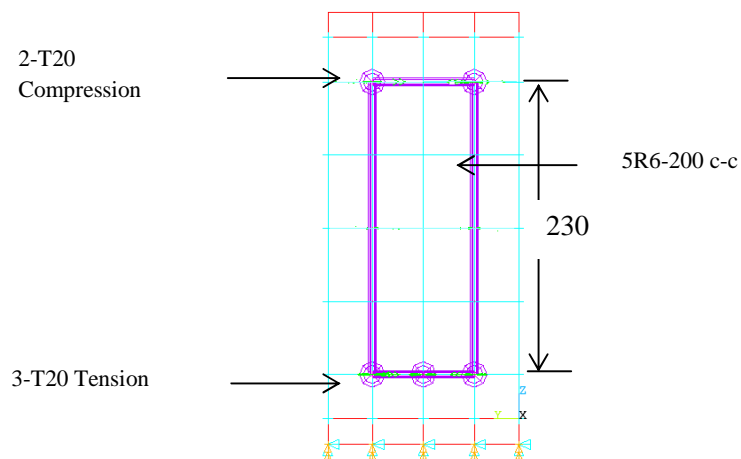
Section beam model for FE-NSC1 beam, showing 3-T20 tension, 2T20 compression and no horizontal web reinforcement, with 6mm links.
